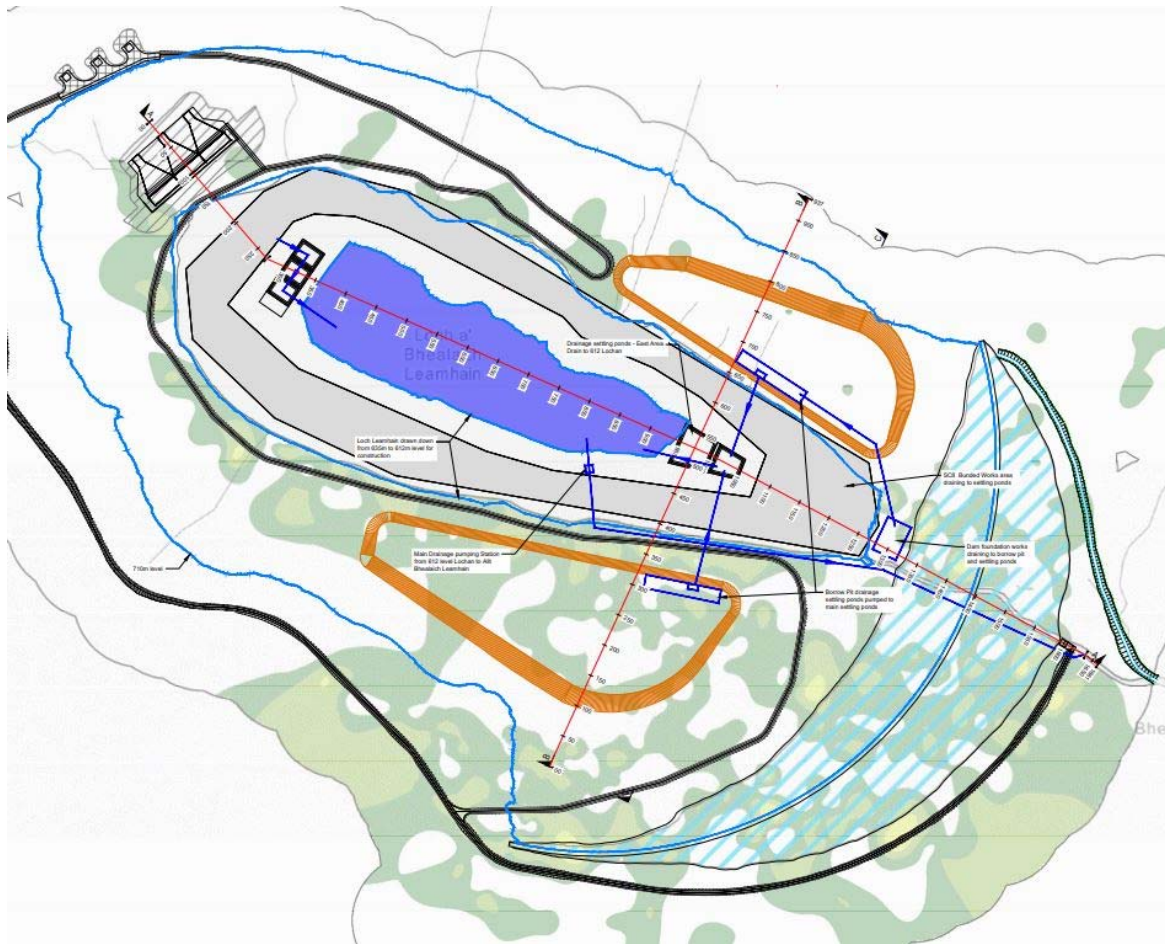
Lowering and Temporary Drainage of Loch Leamhain during Dam Construction
